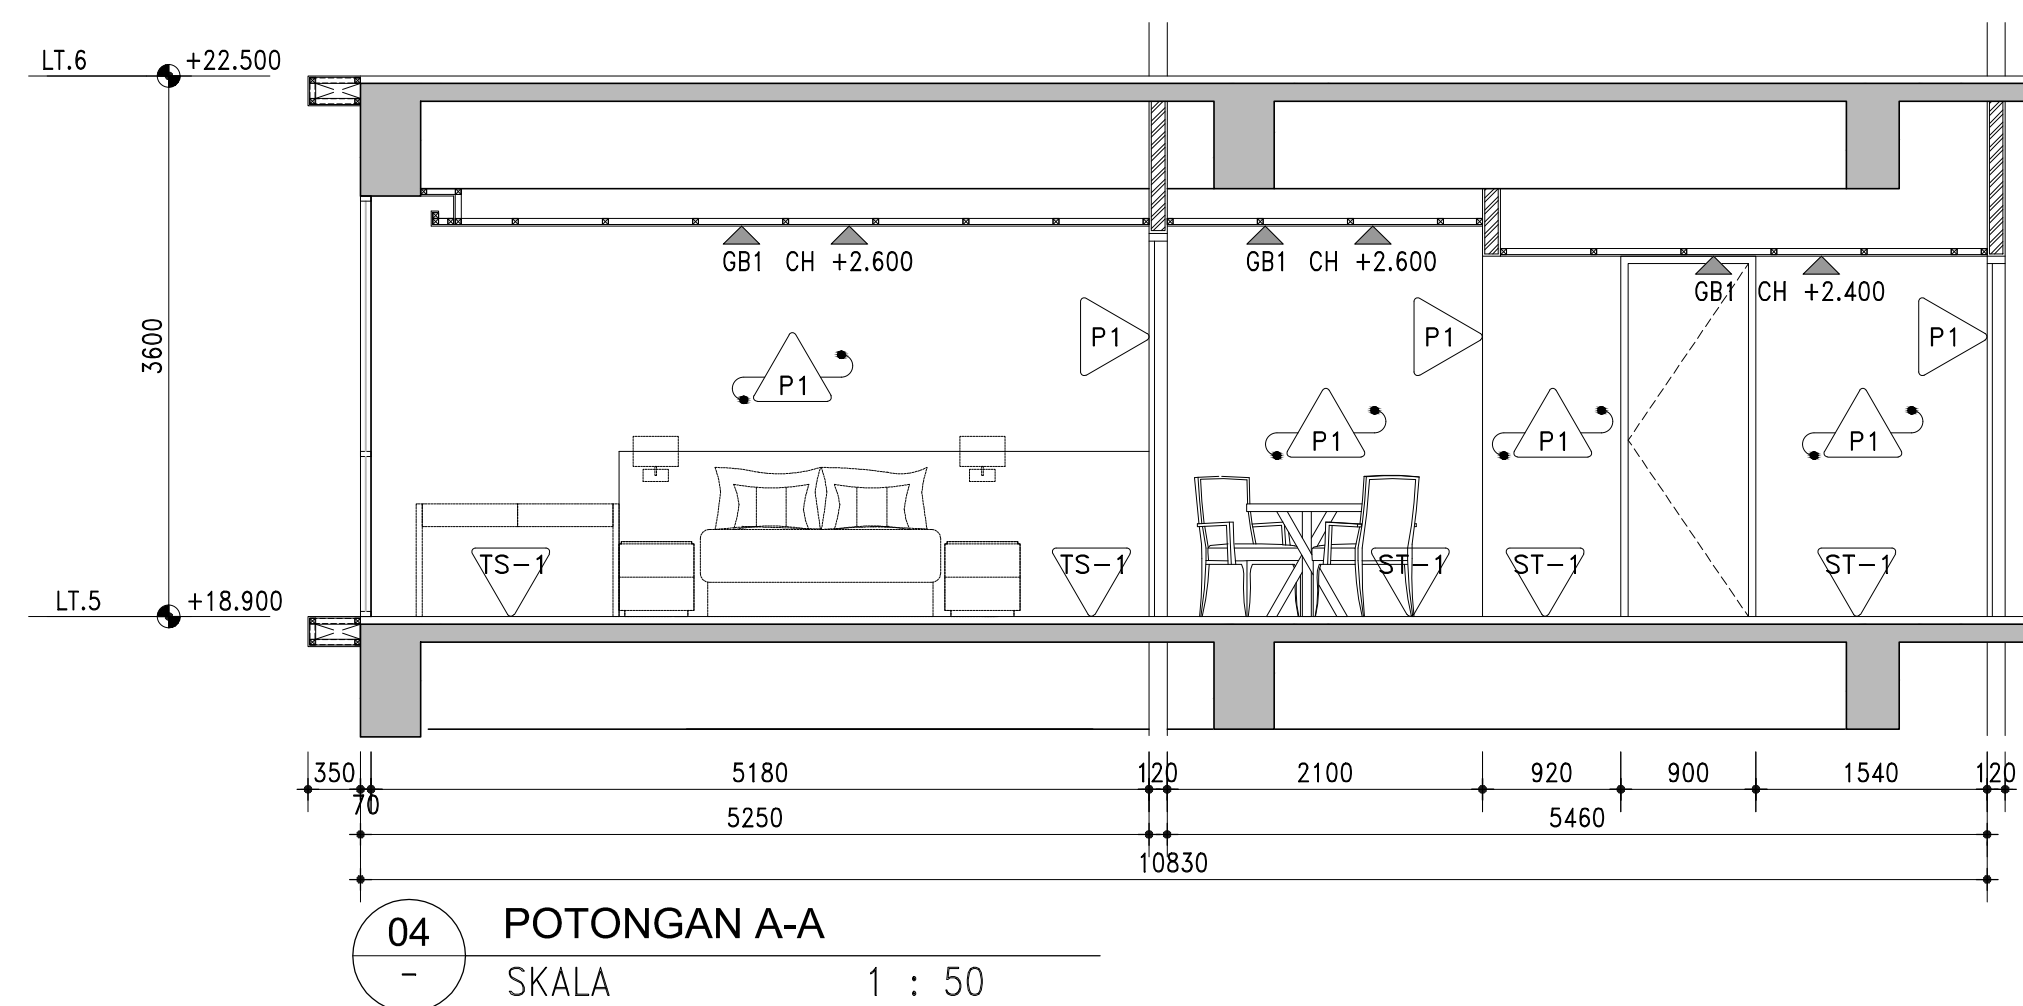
(UNIT NO. 03 & 04)
